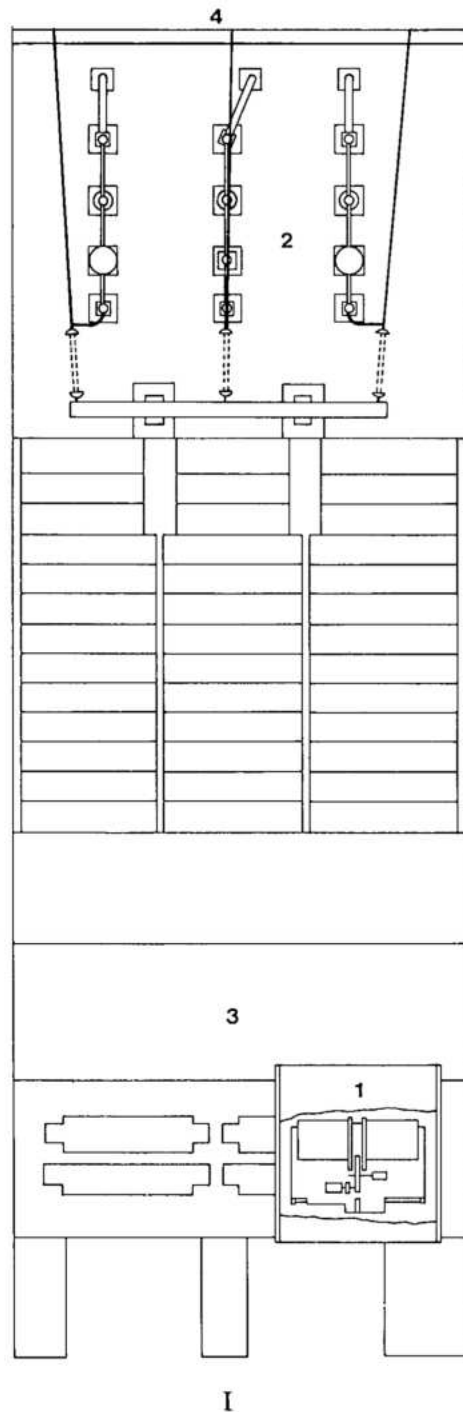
Powerhouse equipment arrangement floors at El. 144 and 144.3
